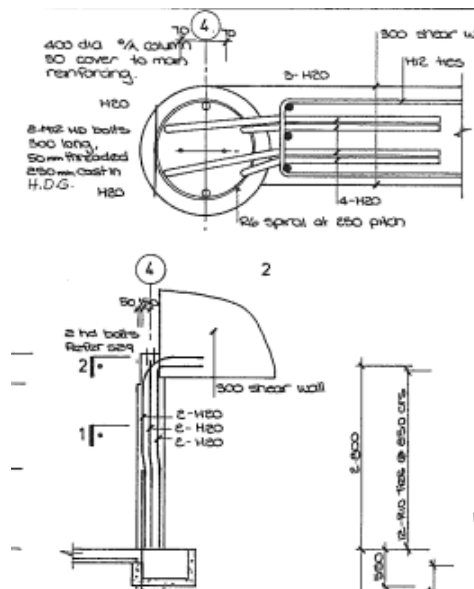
Column at GL 4 D/E (C18) to wall connection detailing at roof level (Design Engineer 1986a)
